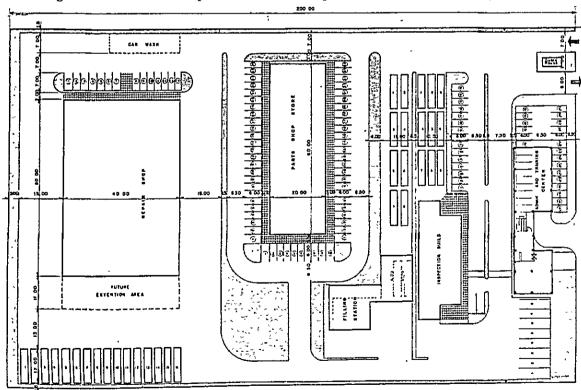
LAYOUT OF BUS MAINTENANCE CENTER
